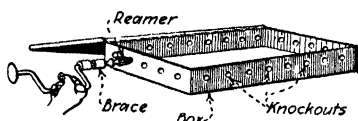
Enlarging a knockout hole in a cabinet with a reamer.
